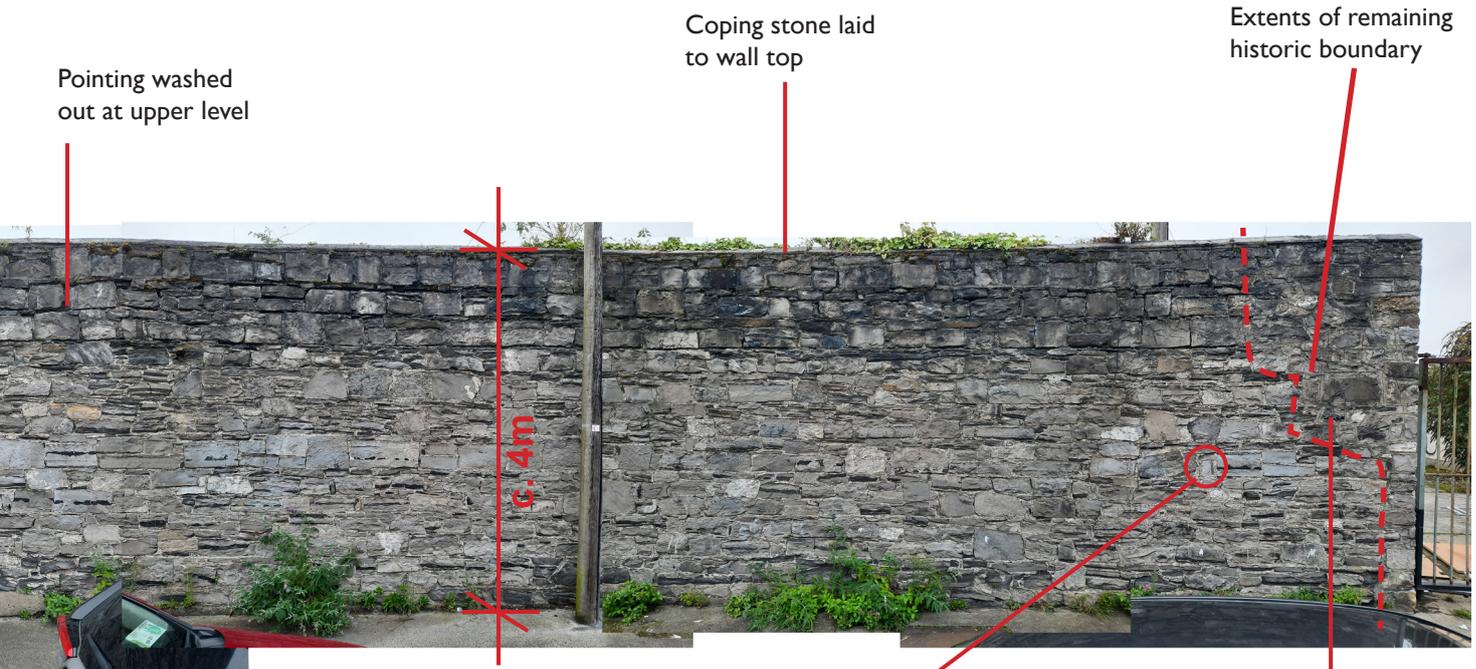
Typical lime mortar found along lower section of wall
